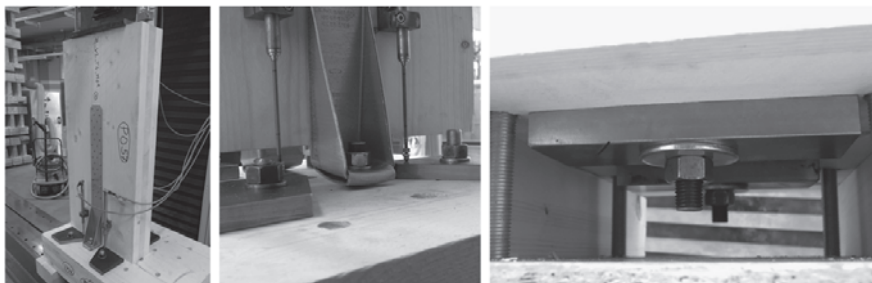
test configuration applied for tension loaded hold-downs in a wall-to-floor joint (internal designation Z_V2_T4)
